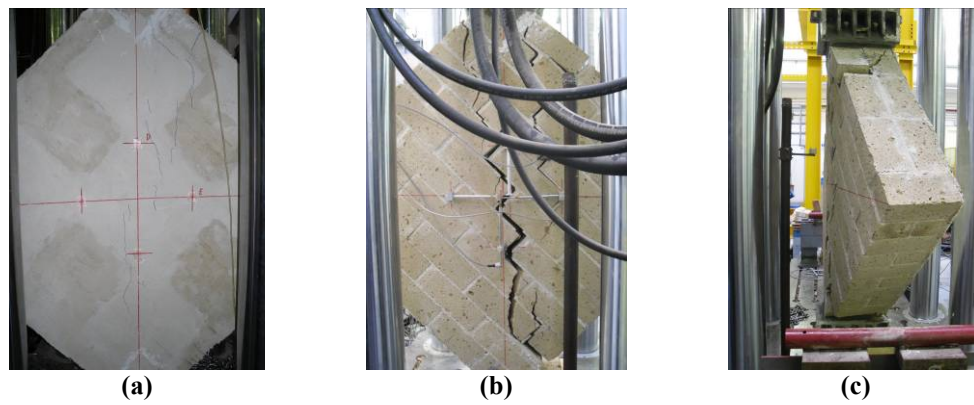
Crack patterns of PRF2 specimen: (a) IMG system side; (b) Masonry side; (c) Lateral view.
